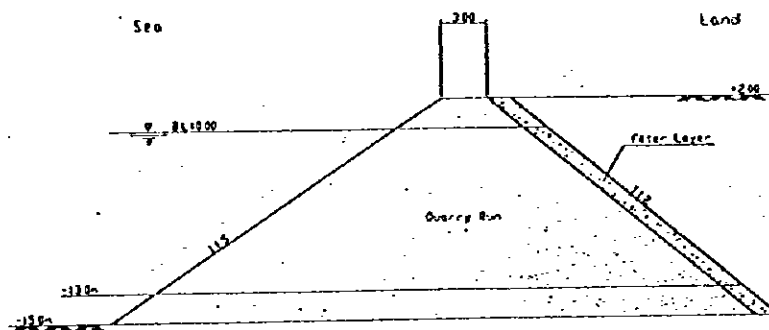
Typical Cross Section of Temporary Inner Revetment
